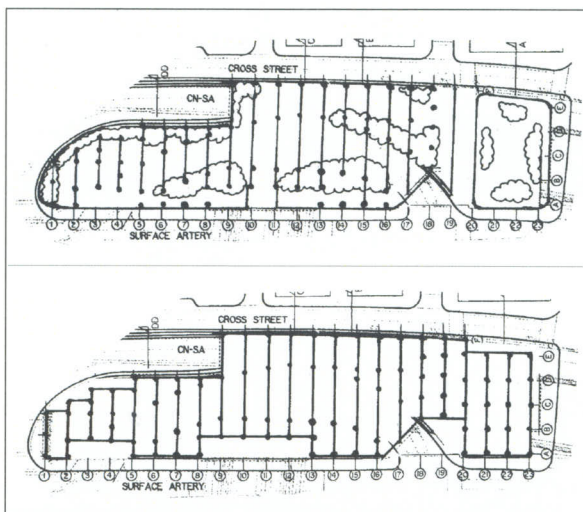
The park's post & beam support structure (top) is based on the CA/T-suggested building footprint (bottom). Base image courtesy Massachusetts Turnpike Authority.
